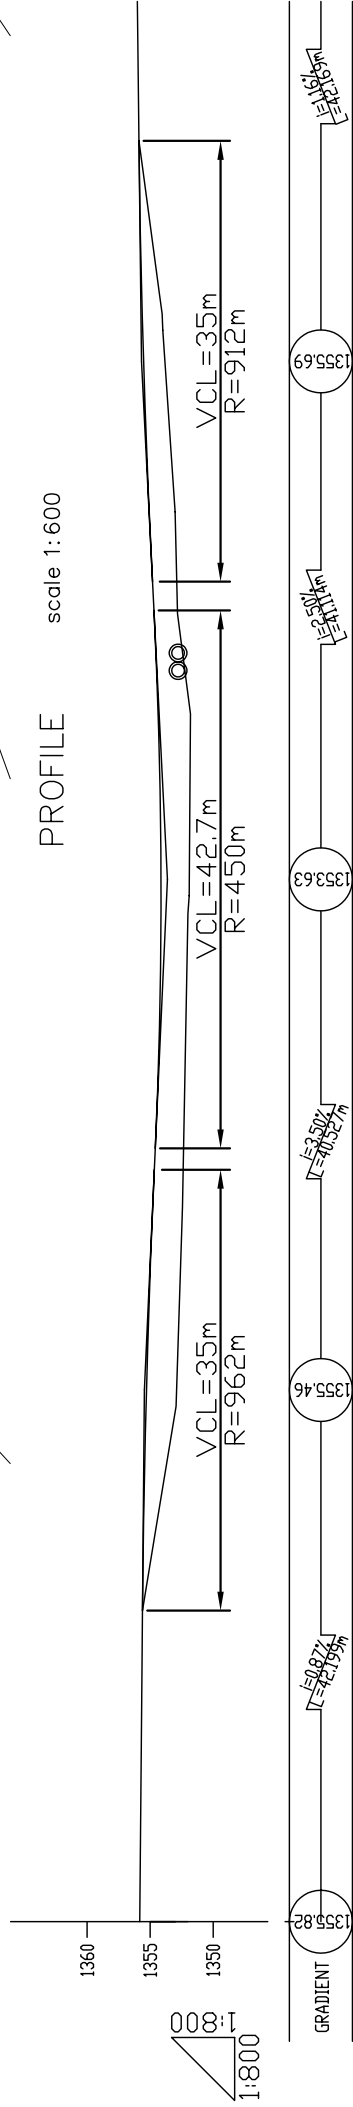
Construction Plan of Khujirt Bridge(1)
